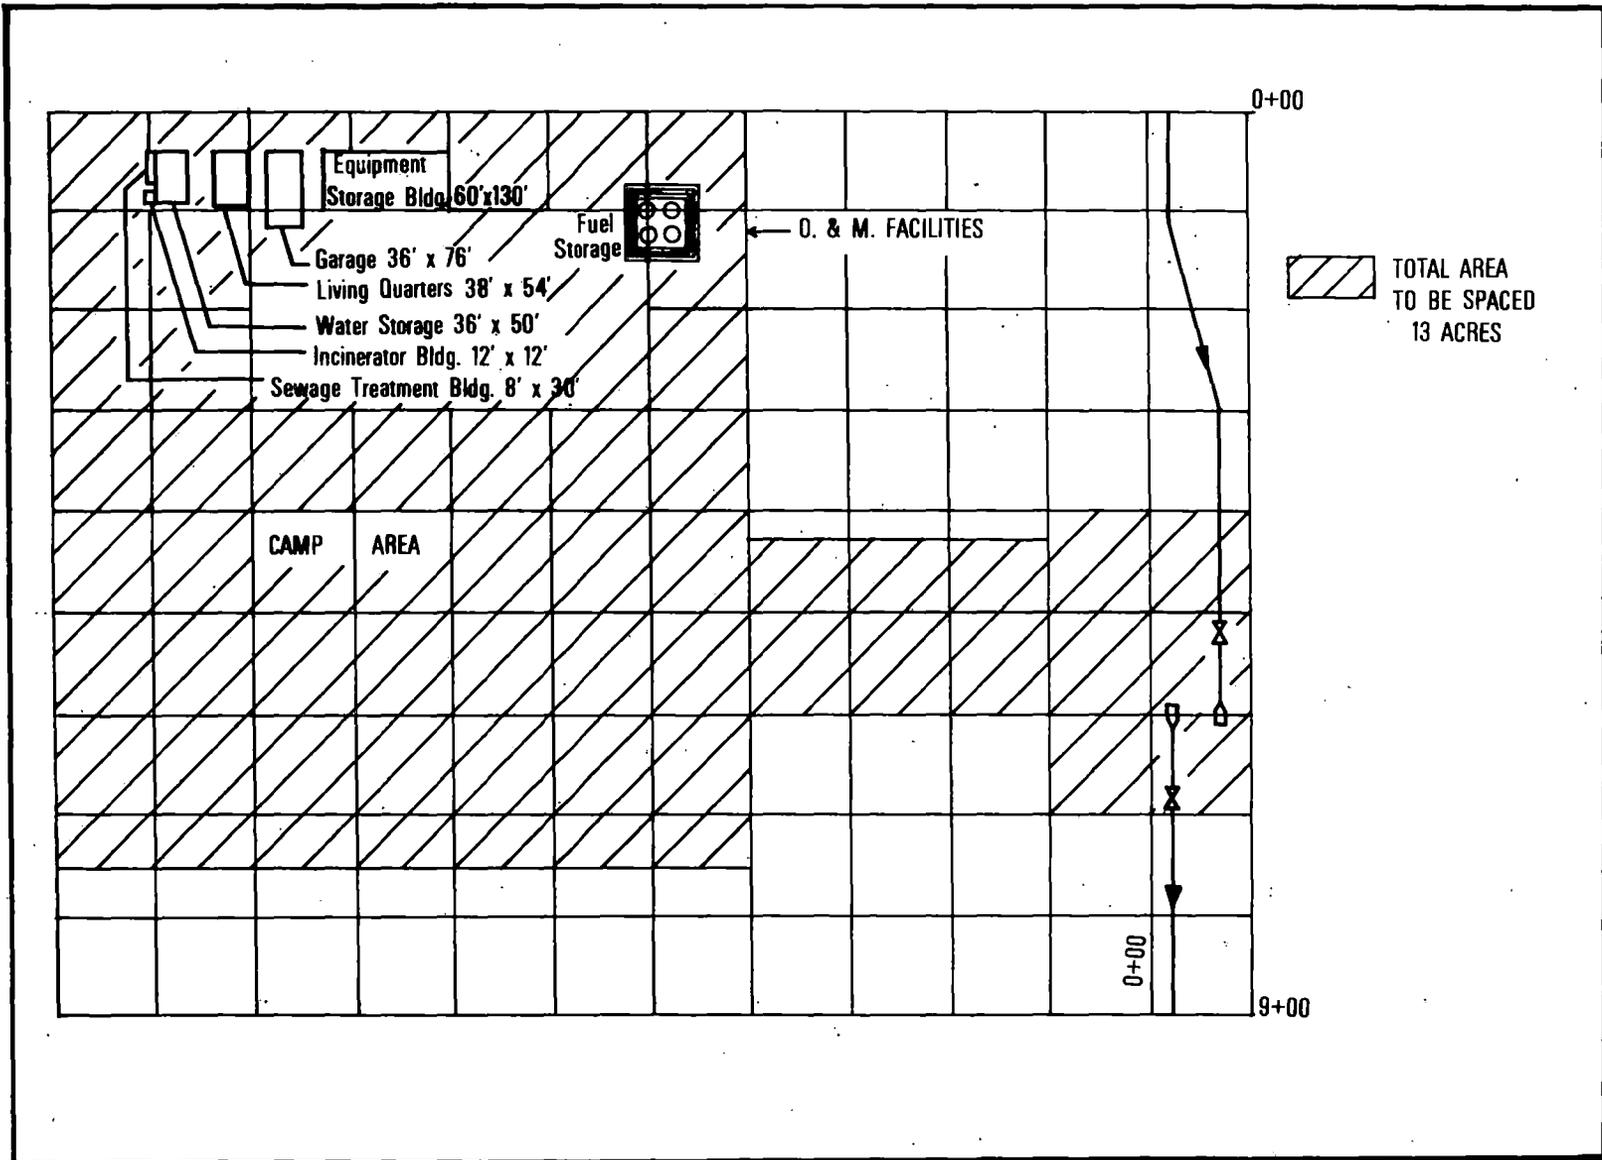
Typical plan of a maintenance station site
